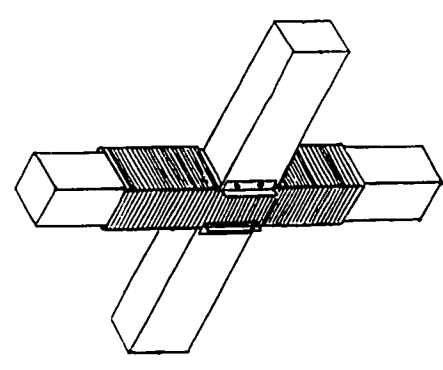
Proposed rehabilitation system for exterior connections with and without slabs and transverse beams
